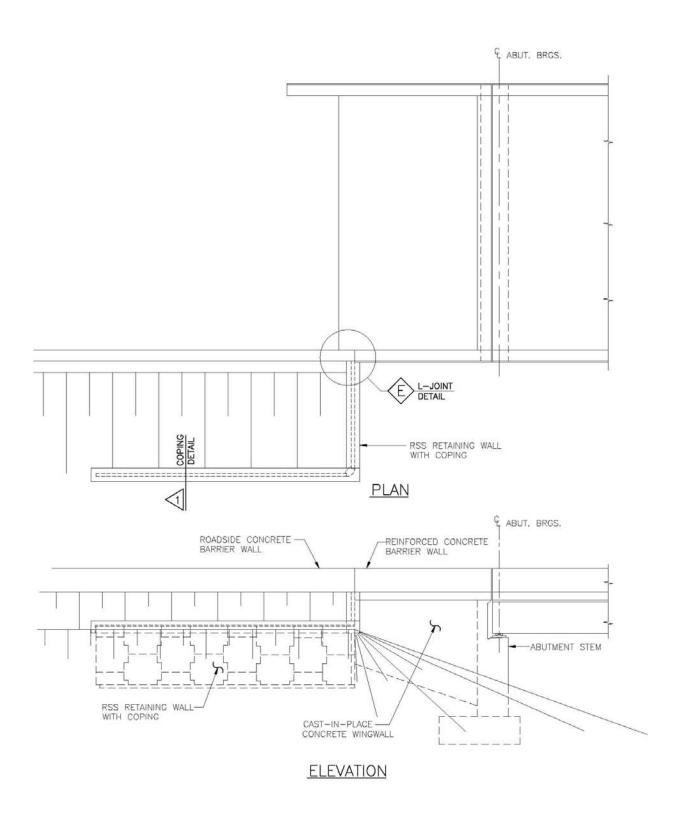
Conventional Abutment with RSS Retaining Walls (offset from wingwalls). For Section 1, see Figure 5.16. For Detail E, see Figure 5.13.
